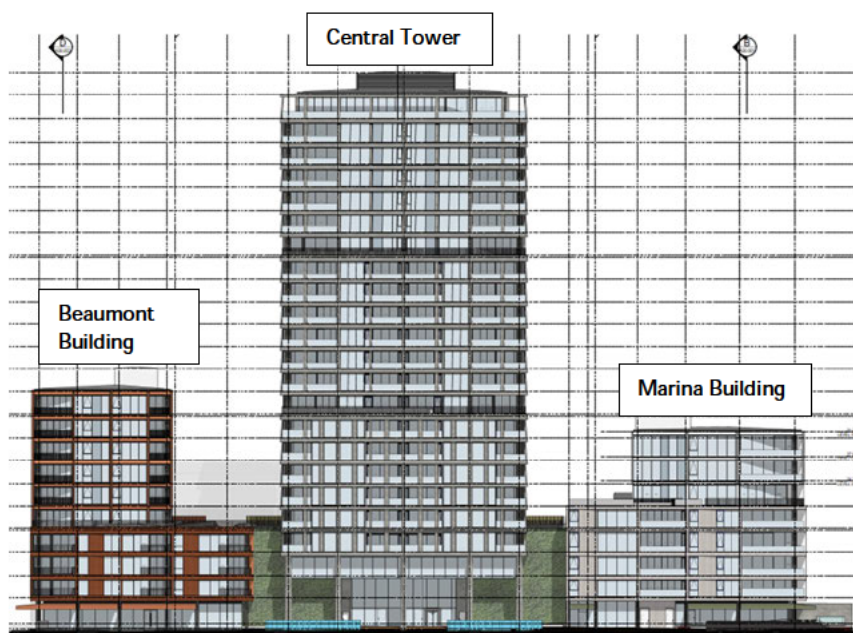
Northern Elevation View (Source: WAM North Elevation, dated 19/12/2025)
